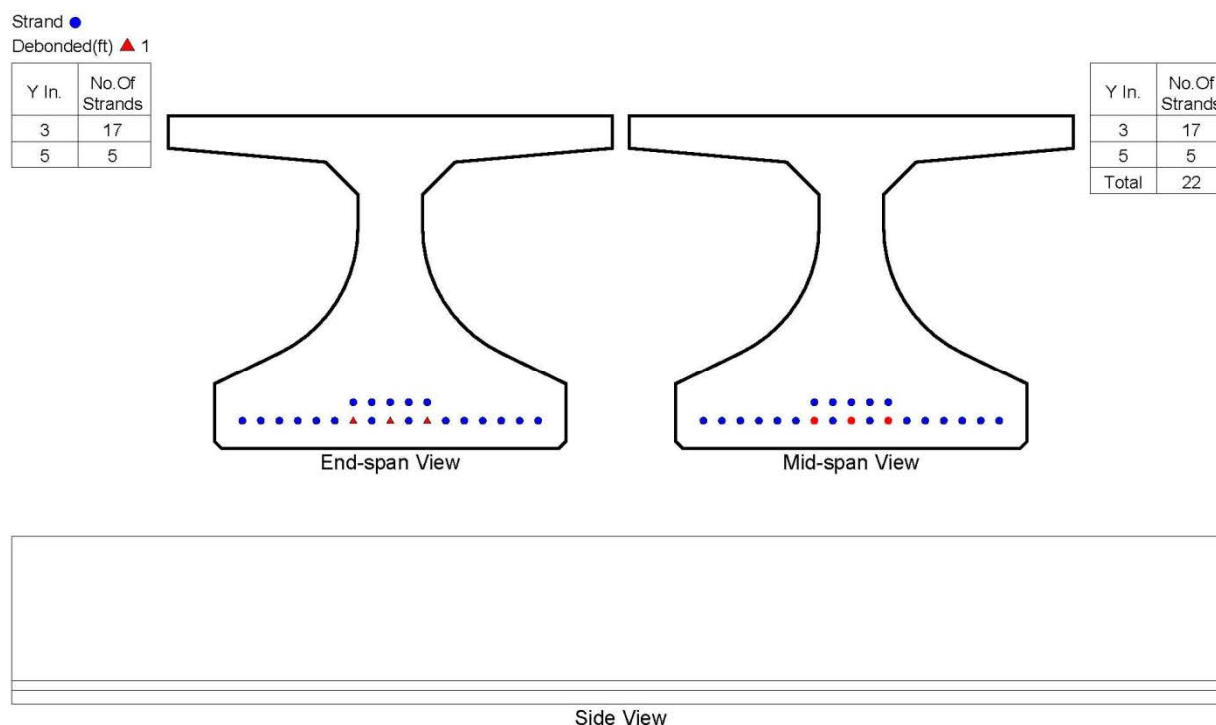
Strand layout and debonding pattern used in SmartBridge models
